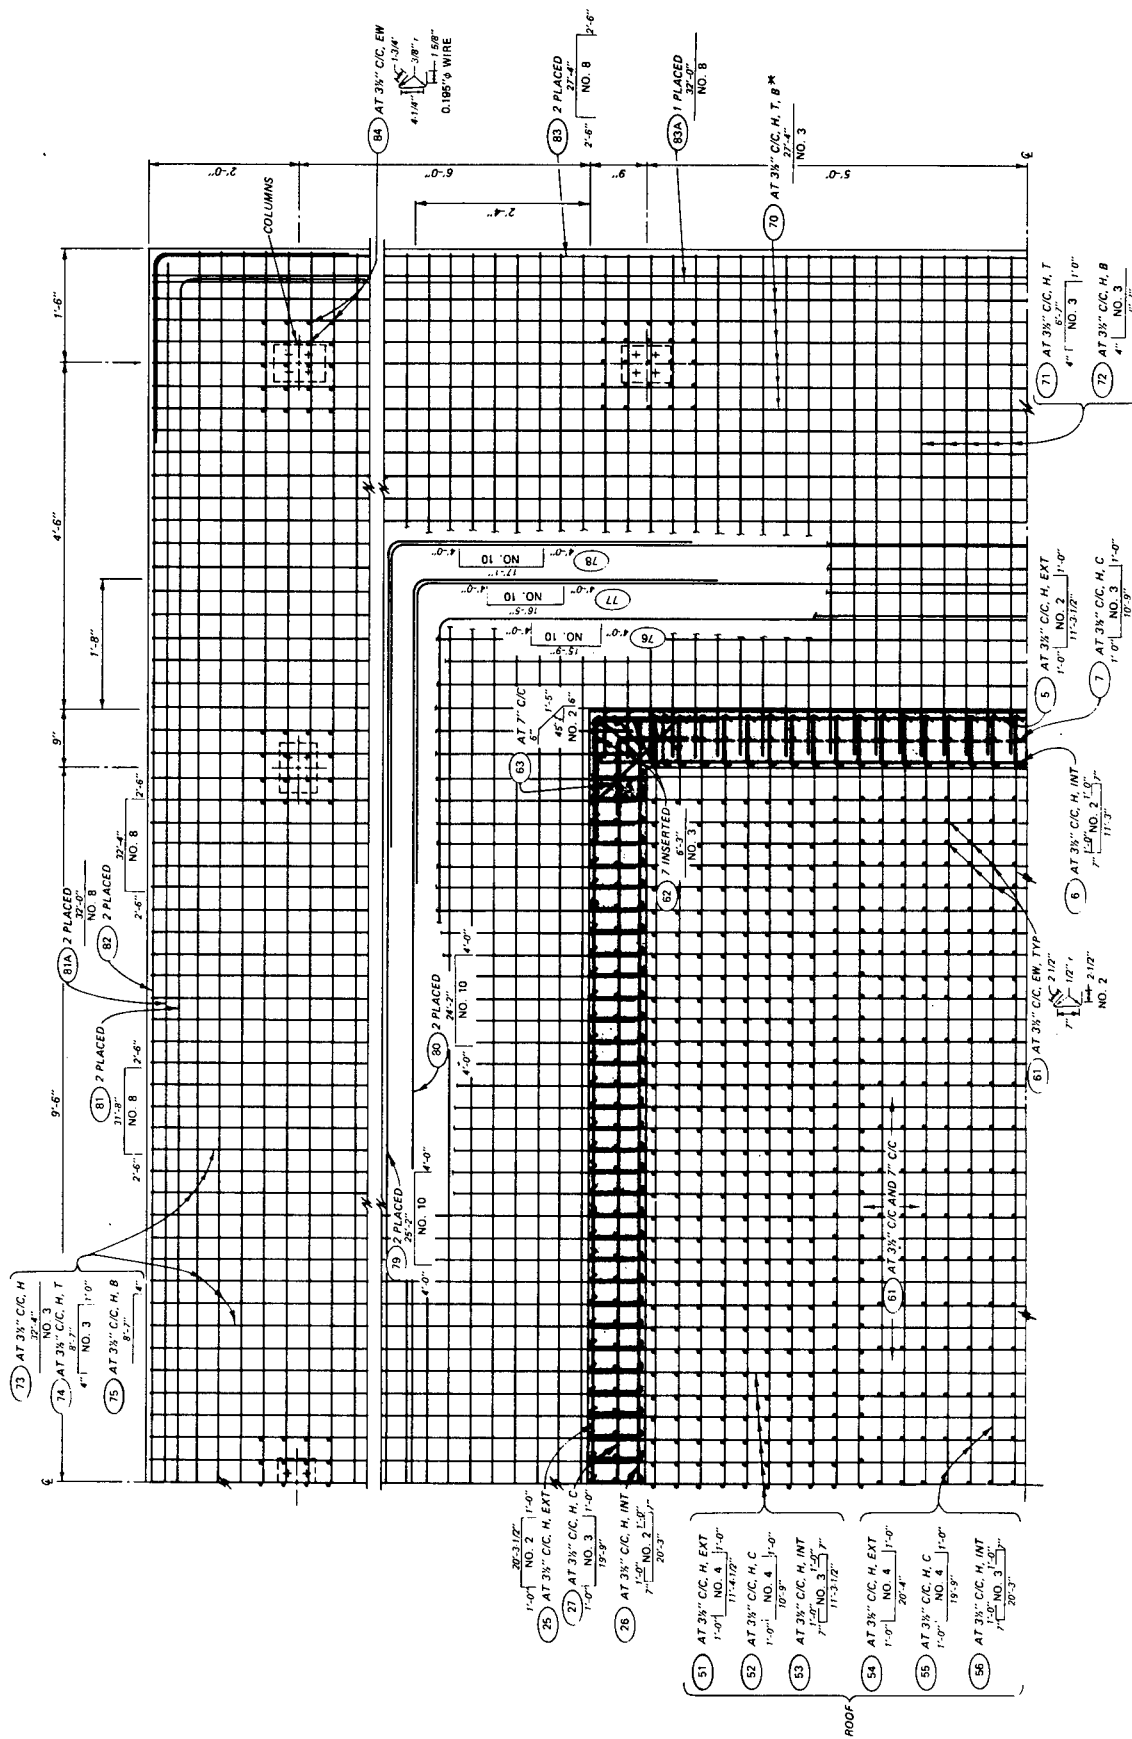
One-quarter plan view of roof, walls, and collar (Sheet 5 of 6)
